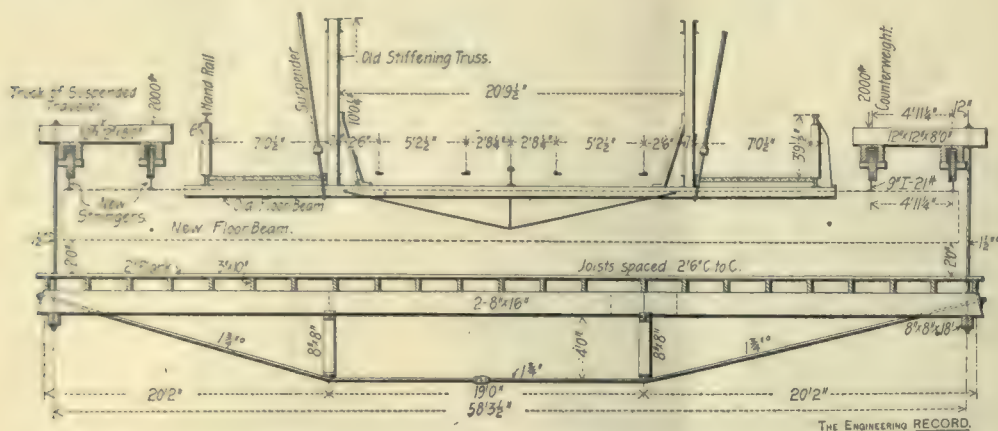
METHOD OF ERECTING FLOOR BEAMS.
